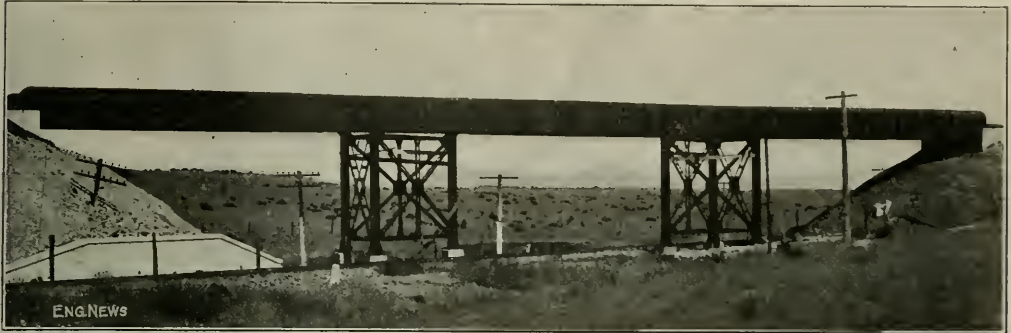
PLATE-GIRDER BRIDGE WITH THREE-POST TOWERS
